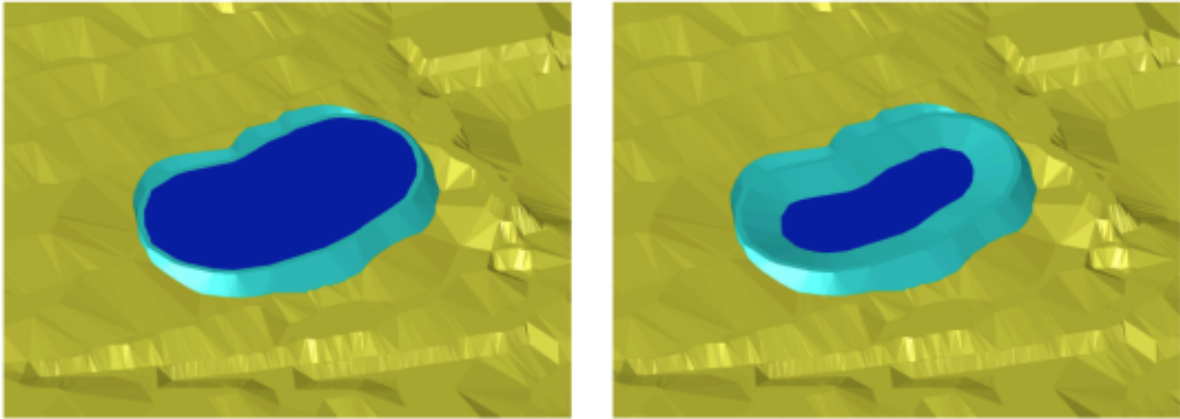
Full 100-year storm pond volume and normal pond elevation.
